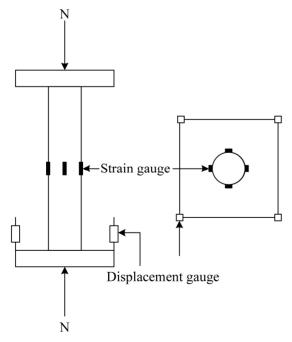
Schematic layout of measurement points of a composite column specimen.
